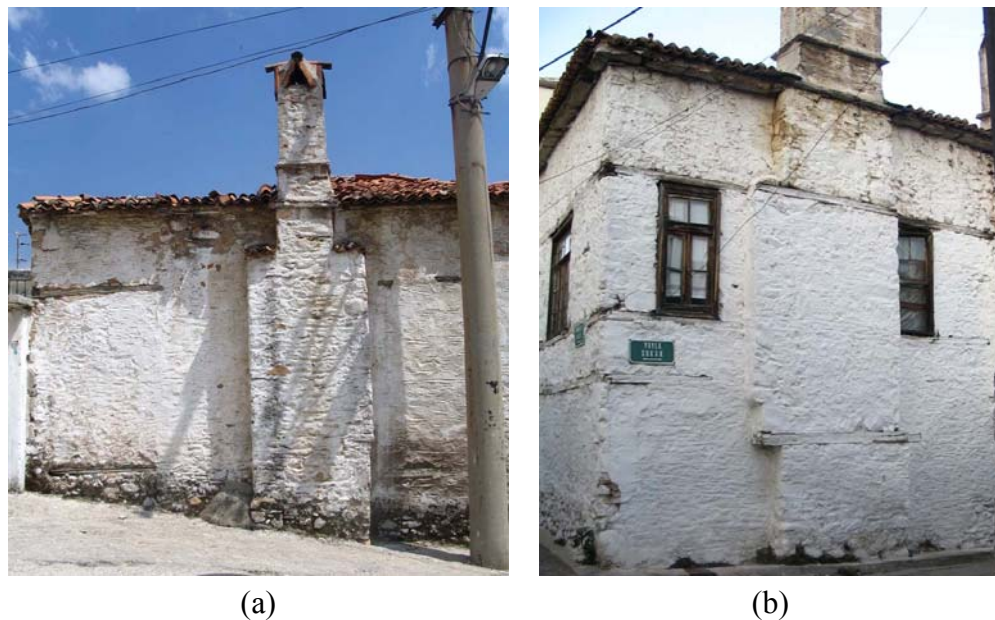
a. Two fireplaces placed in a single protrusion (Camcı St. No: 66), b. Protrusion of fireplace in the first floor set on wall plates above the one in ground floor (Yayla St. No: 18)
